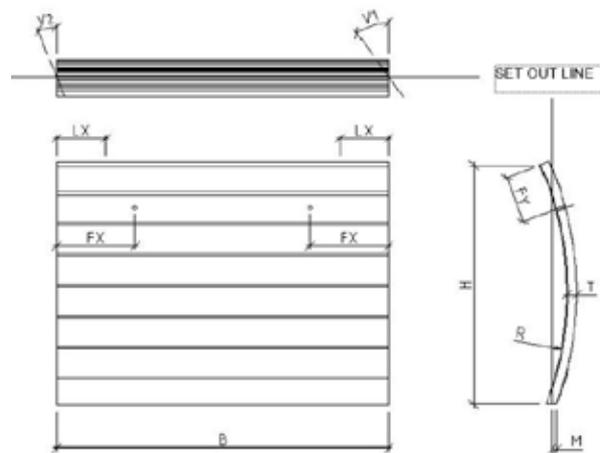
From Novapoint User Manual for Concrete Wall elements.
